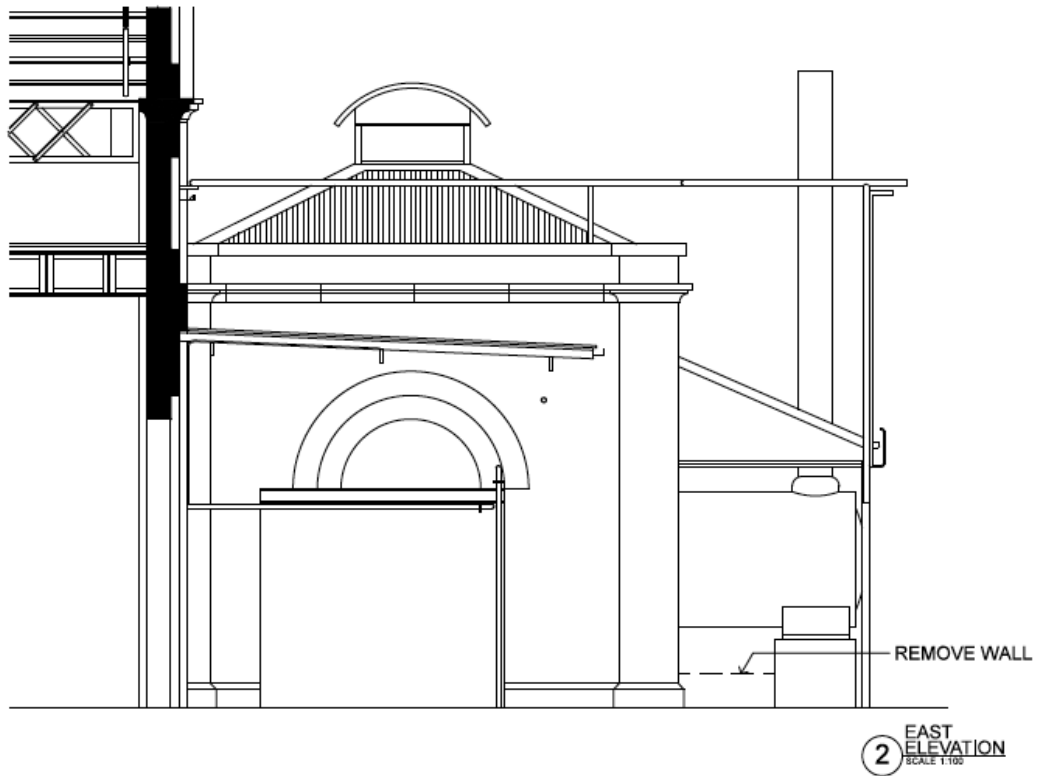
The existing eastern elevation of the Boiler Bay. Note the cut-out in the wall which has been bridged with a metal beam.
